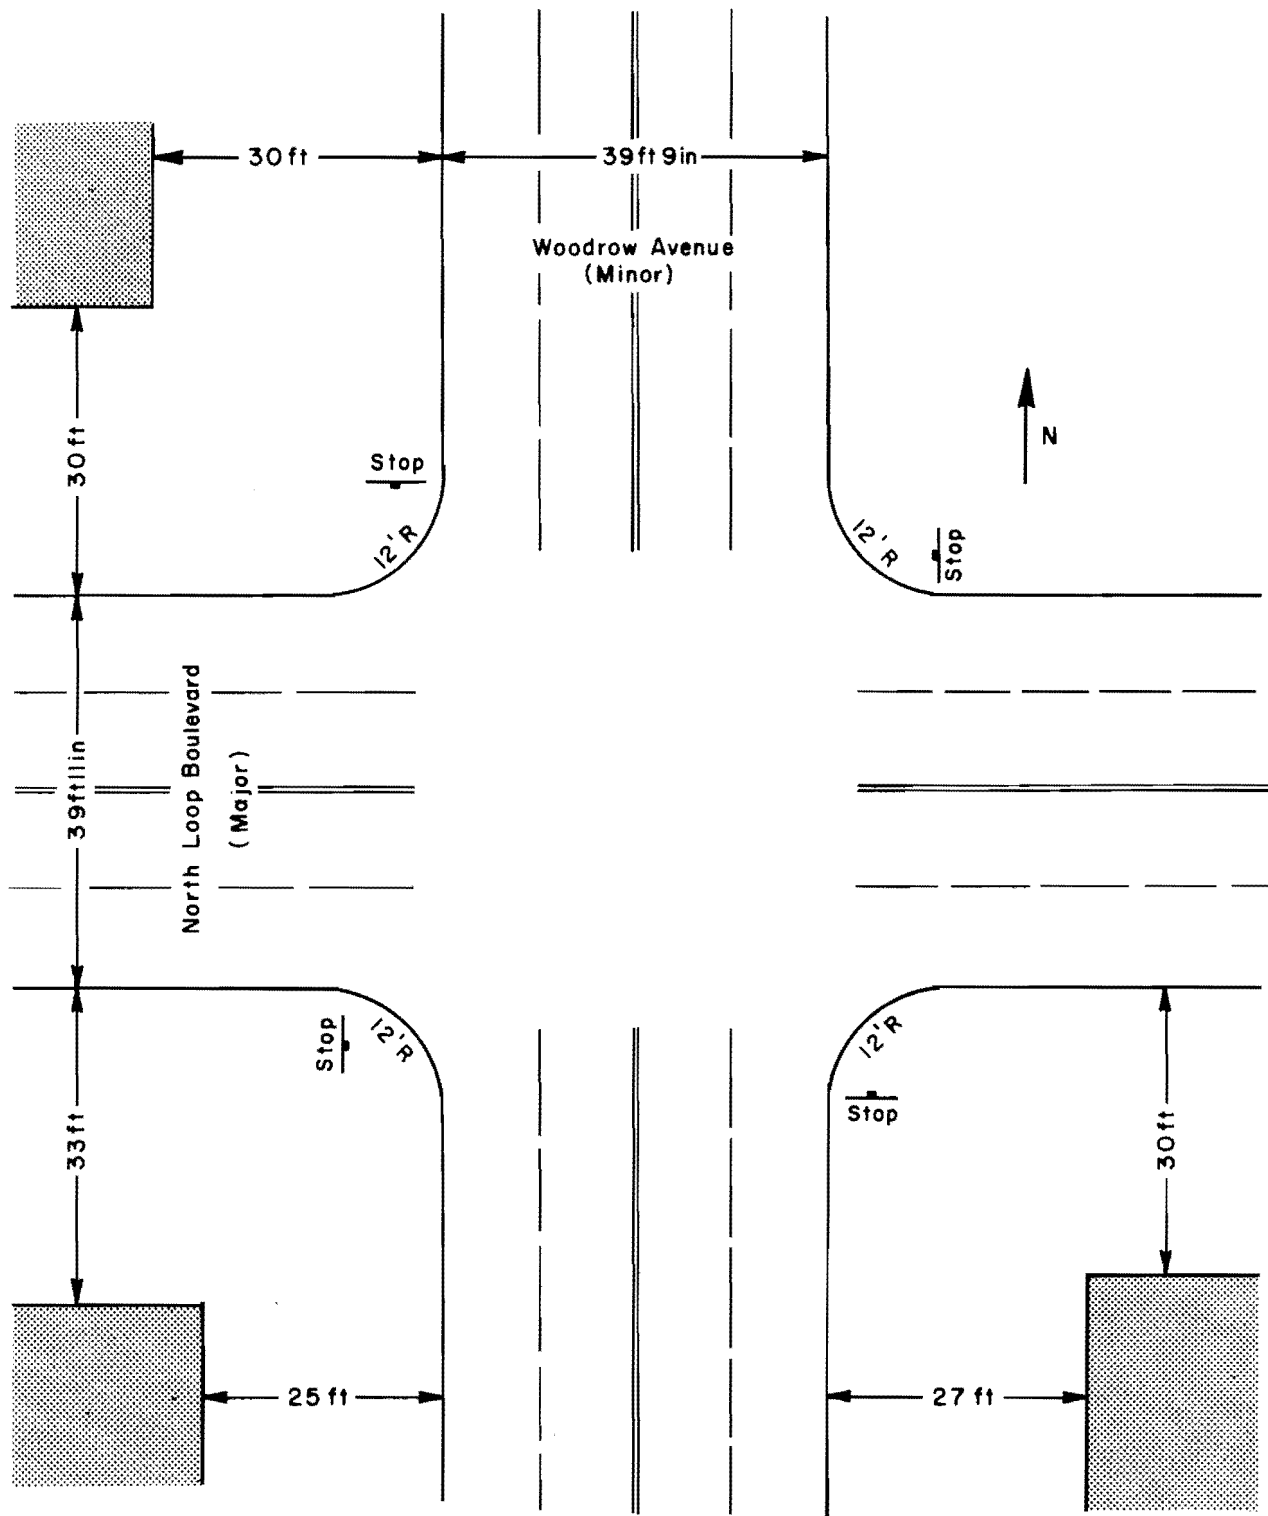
Geometric layout of North Loop and Woodrow intersection (four-way stop).
